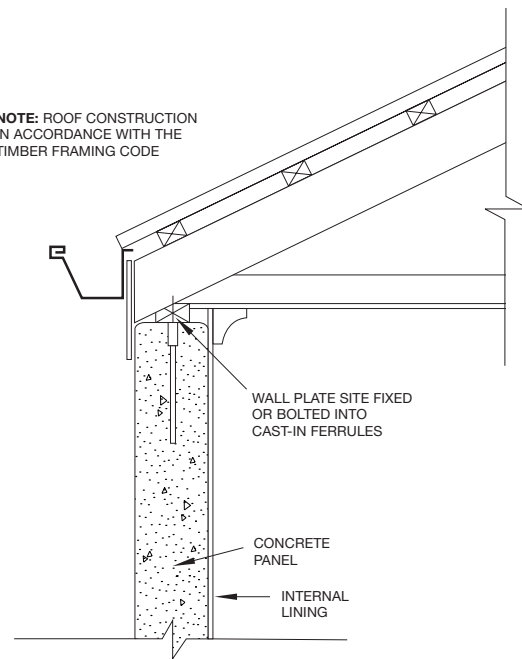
Panel to Roof Connection. (Roof framing is supported by top of wall panel via bolting into cast-in ferrules)
